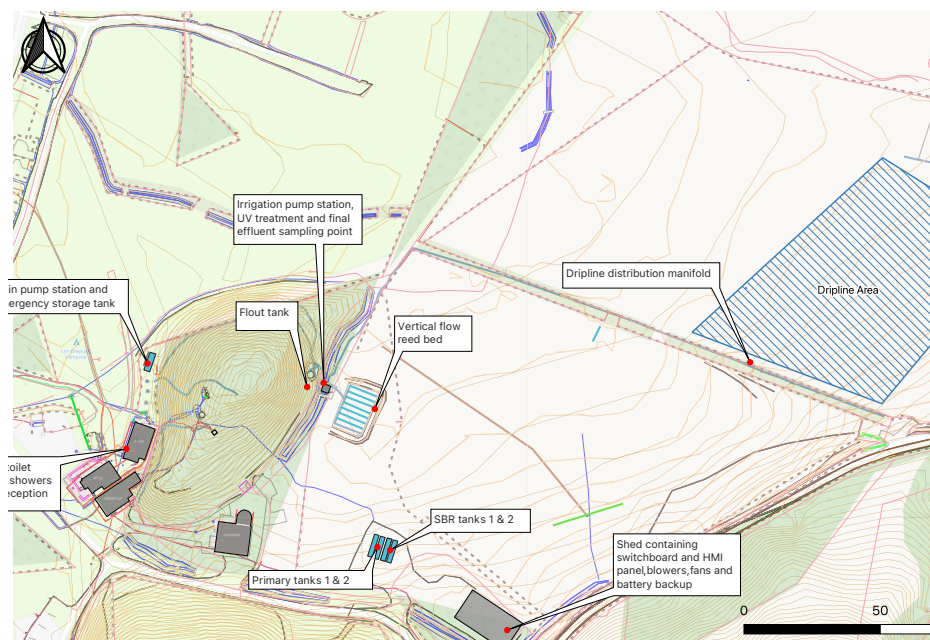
Excerpt of Wastewater Infrastructure Site Plan
